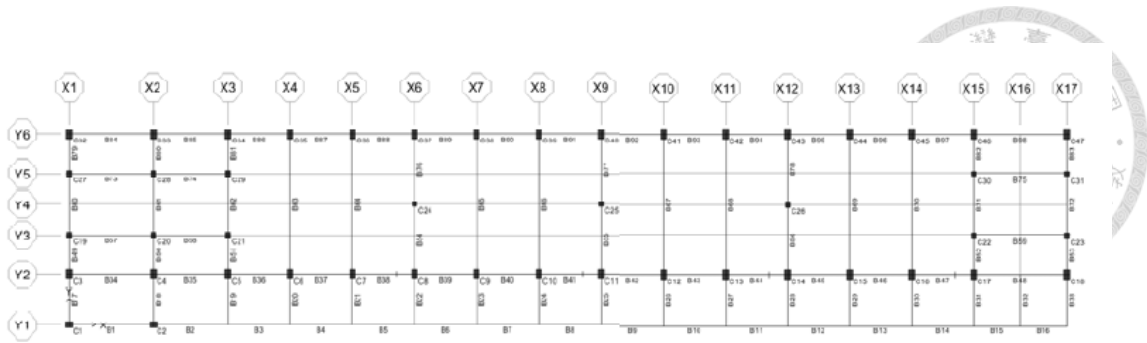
Three-story conventional school building floor plan layout (Yeh and Chou 2017)
